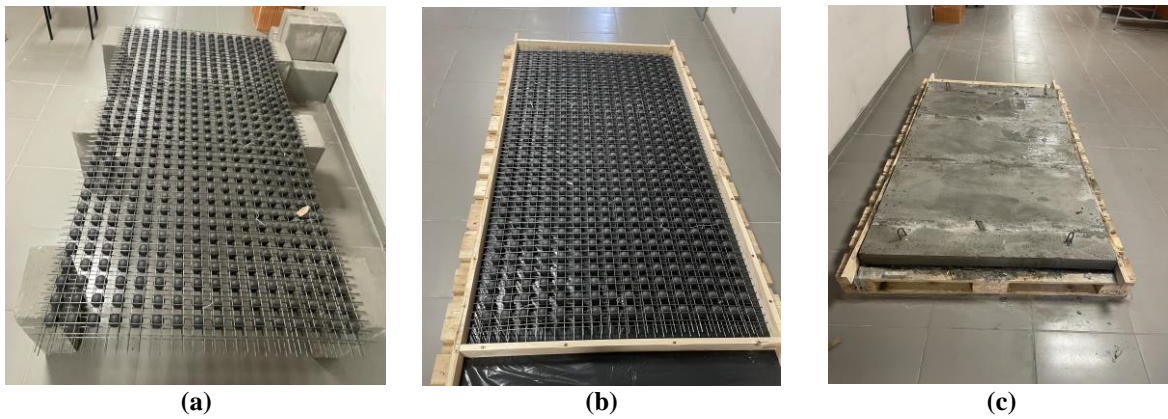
Bubble deck slab, (a) meshes of steel bars with balls between, (b) model of slab prepared for concreting, (c) concreted slab
